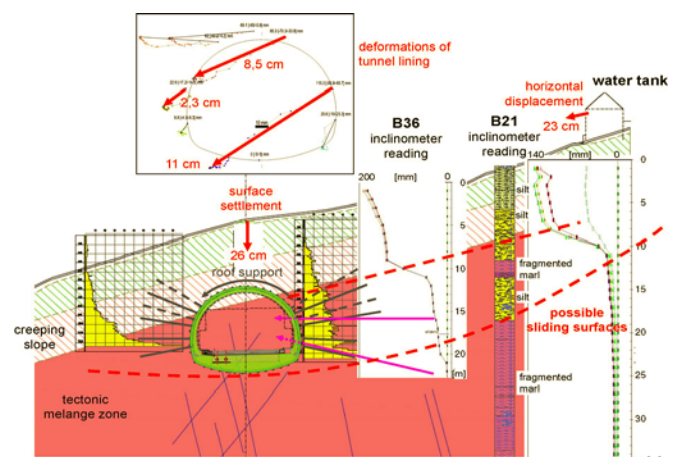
(b) Tunnel Section with NATM (Adam, Markiewicz & Brunner, 2000)
